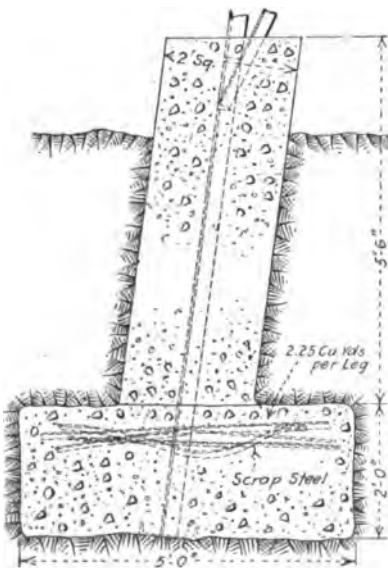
GREAT WESTERN POWER CO. FOOTINGS FOR ANCHOR TOWER ON TENSION SIDE OF ANGLES
